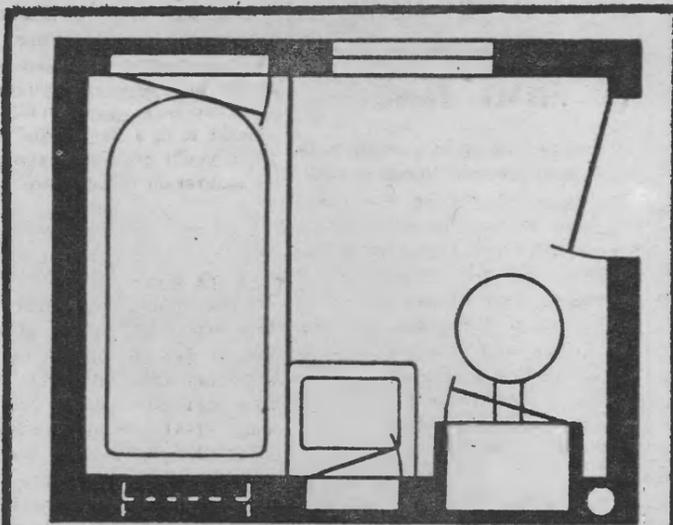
Bathroom, 5 by 6½ feet, has space for door to open into room.
